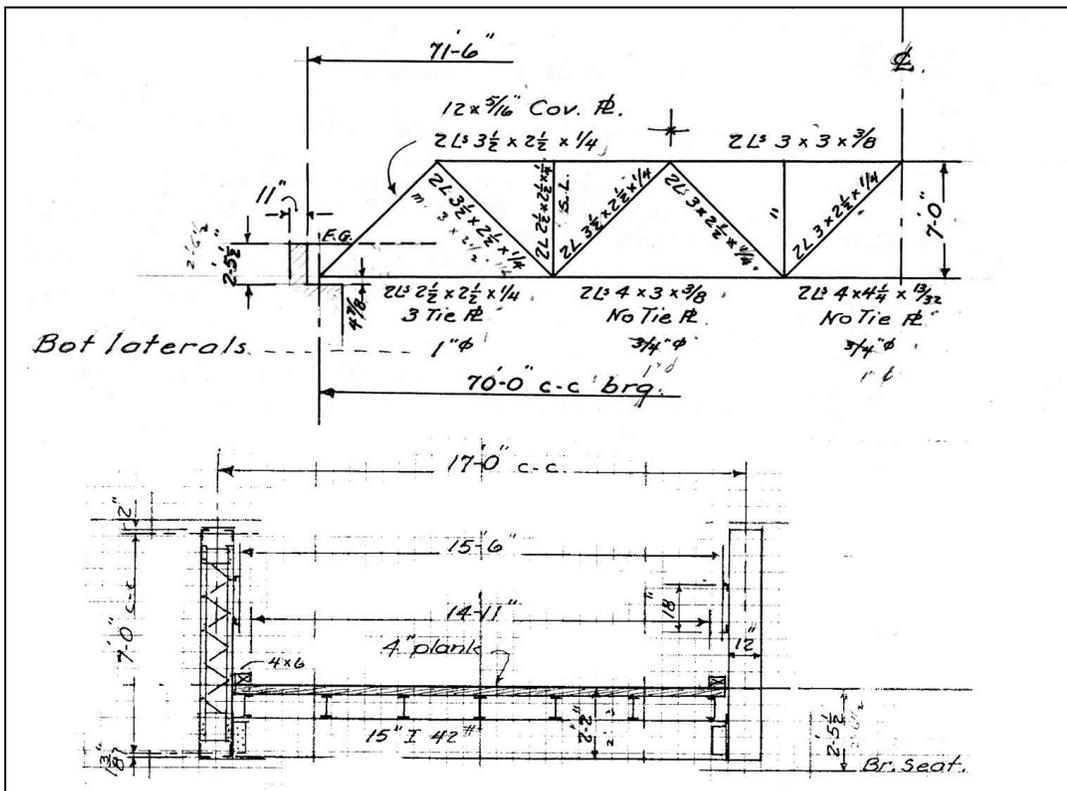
Hopkinton 134/166 East Penacook Road over Blackwater River (1907). Elevation and section sketch (NHHD Bridge Inventory Card).
